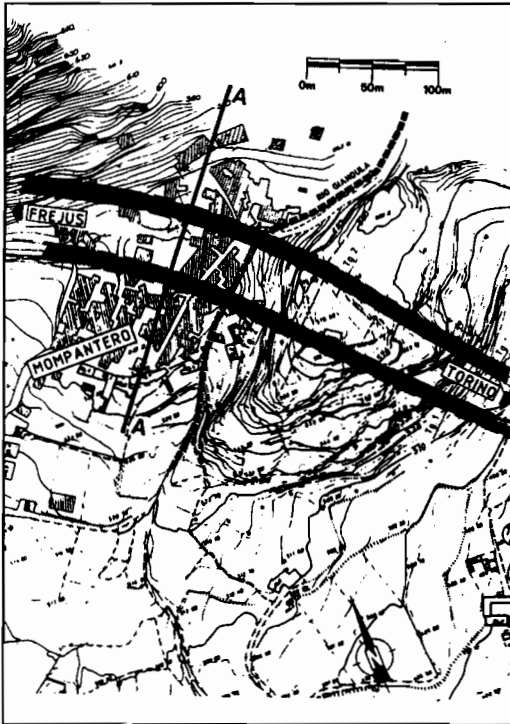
Plan view of the project showing the tunnel intersection with Giandula river
